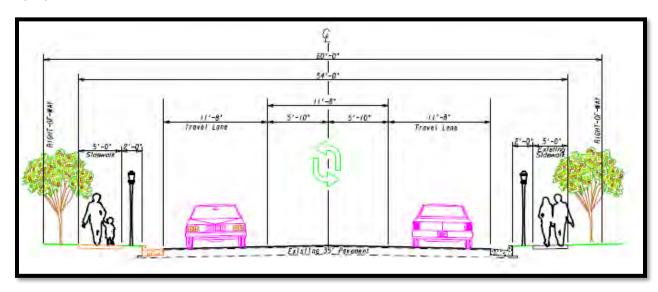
Proposed Typical Section – Alternative 2 – West First St. from Montgomery Ave. to Austin Ave.
